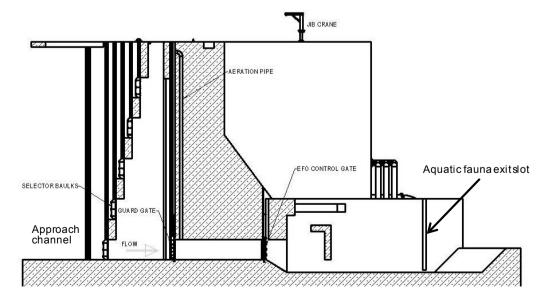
Rookwood Weir right bank proposed outlets and fish lock design
